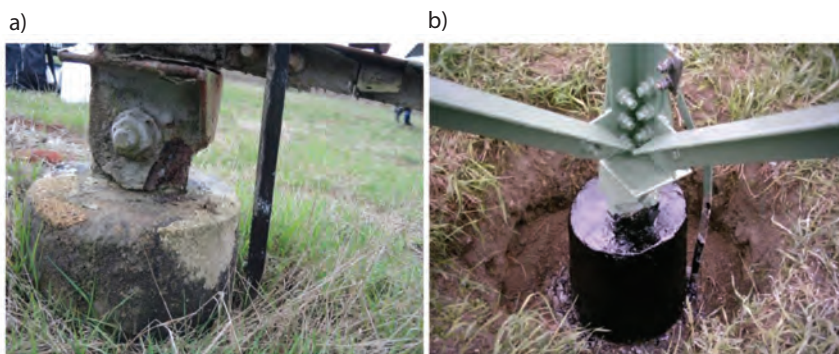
A completely deteriorated component binding the steel structure to the concrete foundation (a) and an example of a properly protected fixture binding the steel structure to the concrete foundation and of a concrete component in the ground
